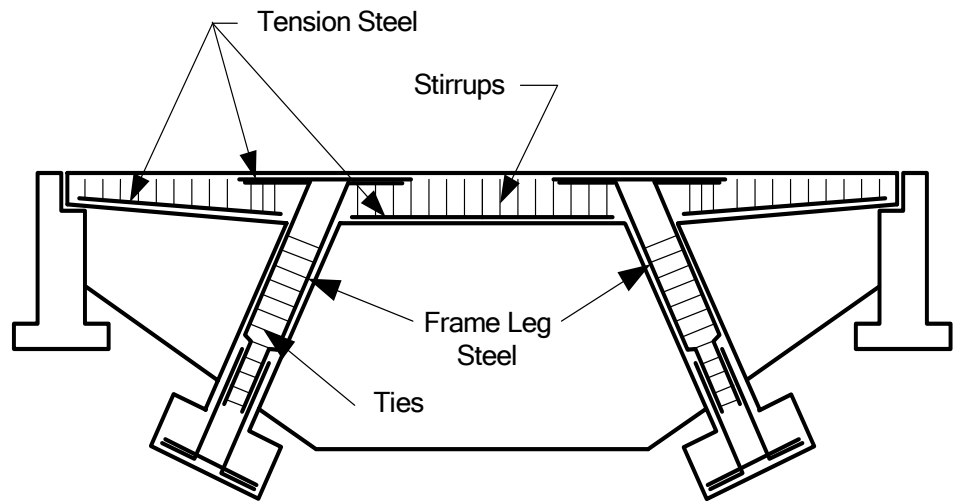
Tension, Shear, and Column Reinforcement in a Typical K-frame
